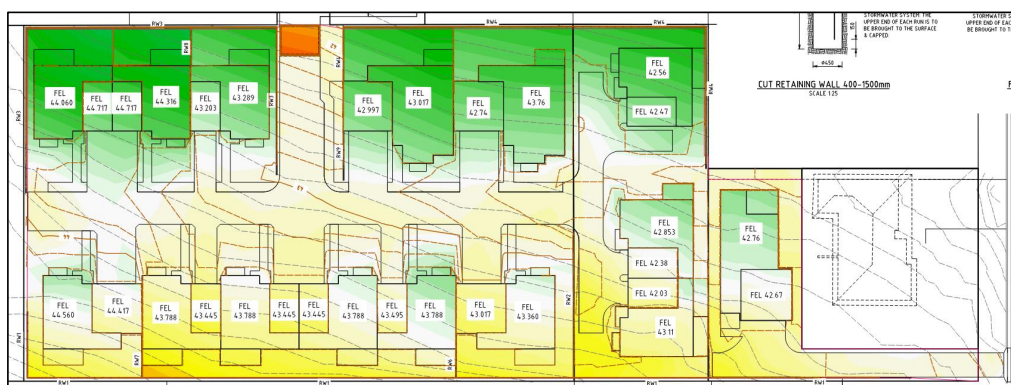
Proposed cut and fill across the site showing retaining walls across the site
